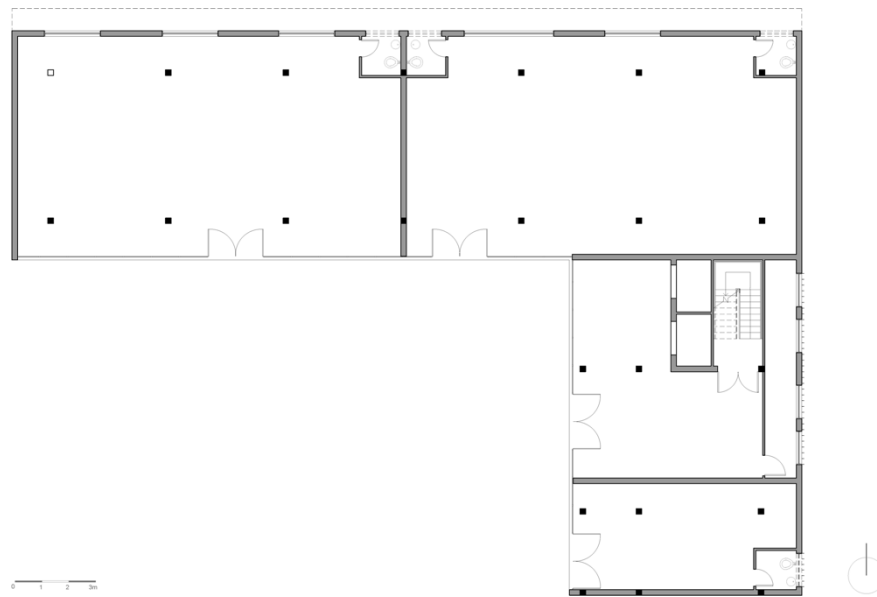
Footprint and interior layout of CS01: ground floor.
